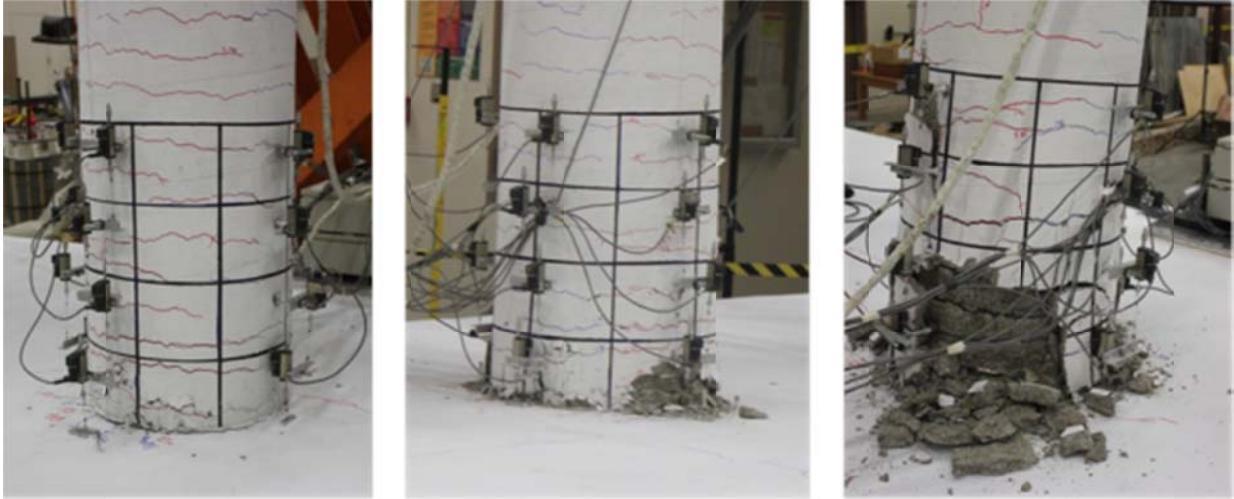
Propagation of the column cracking and spalling in the plastic hinge zone
